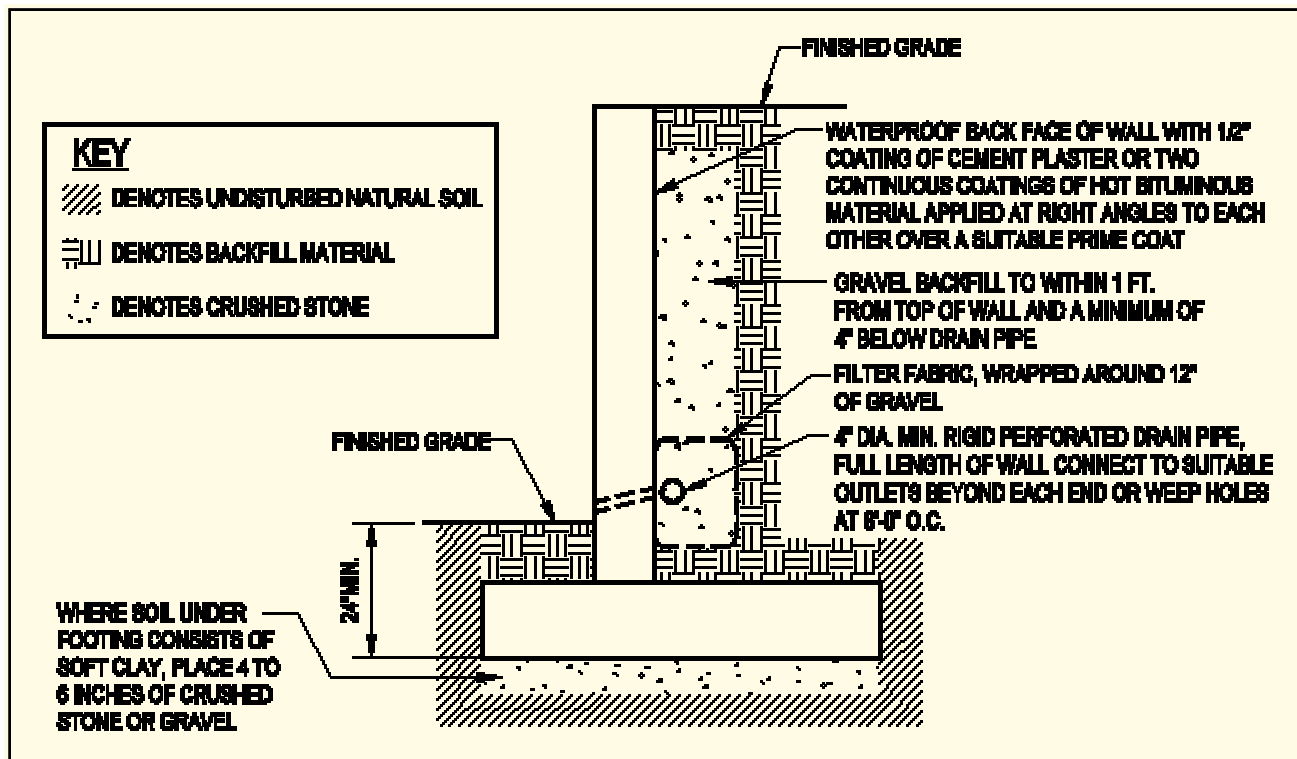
TYPICAL BACKFILL AND DRAINAGE DETAIL
